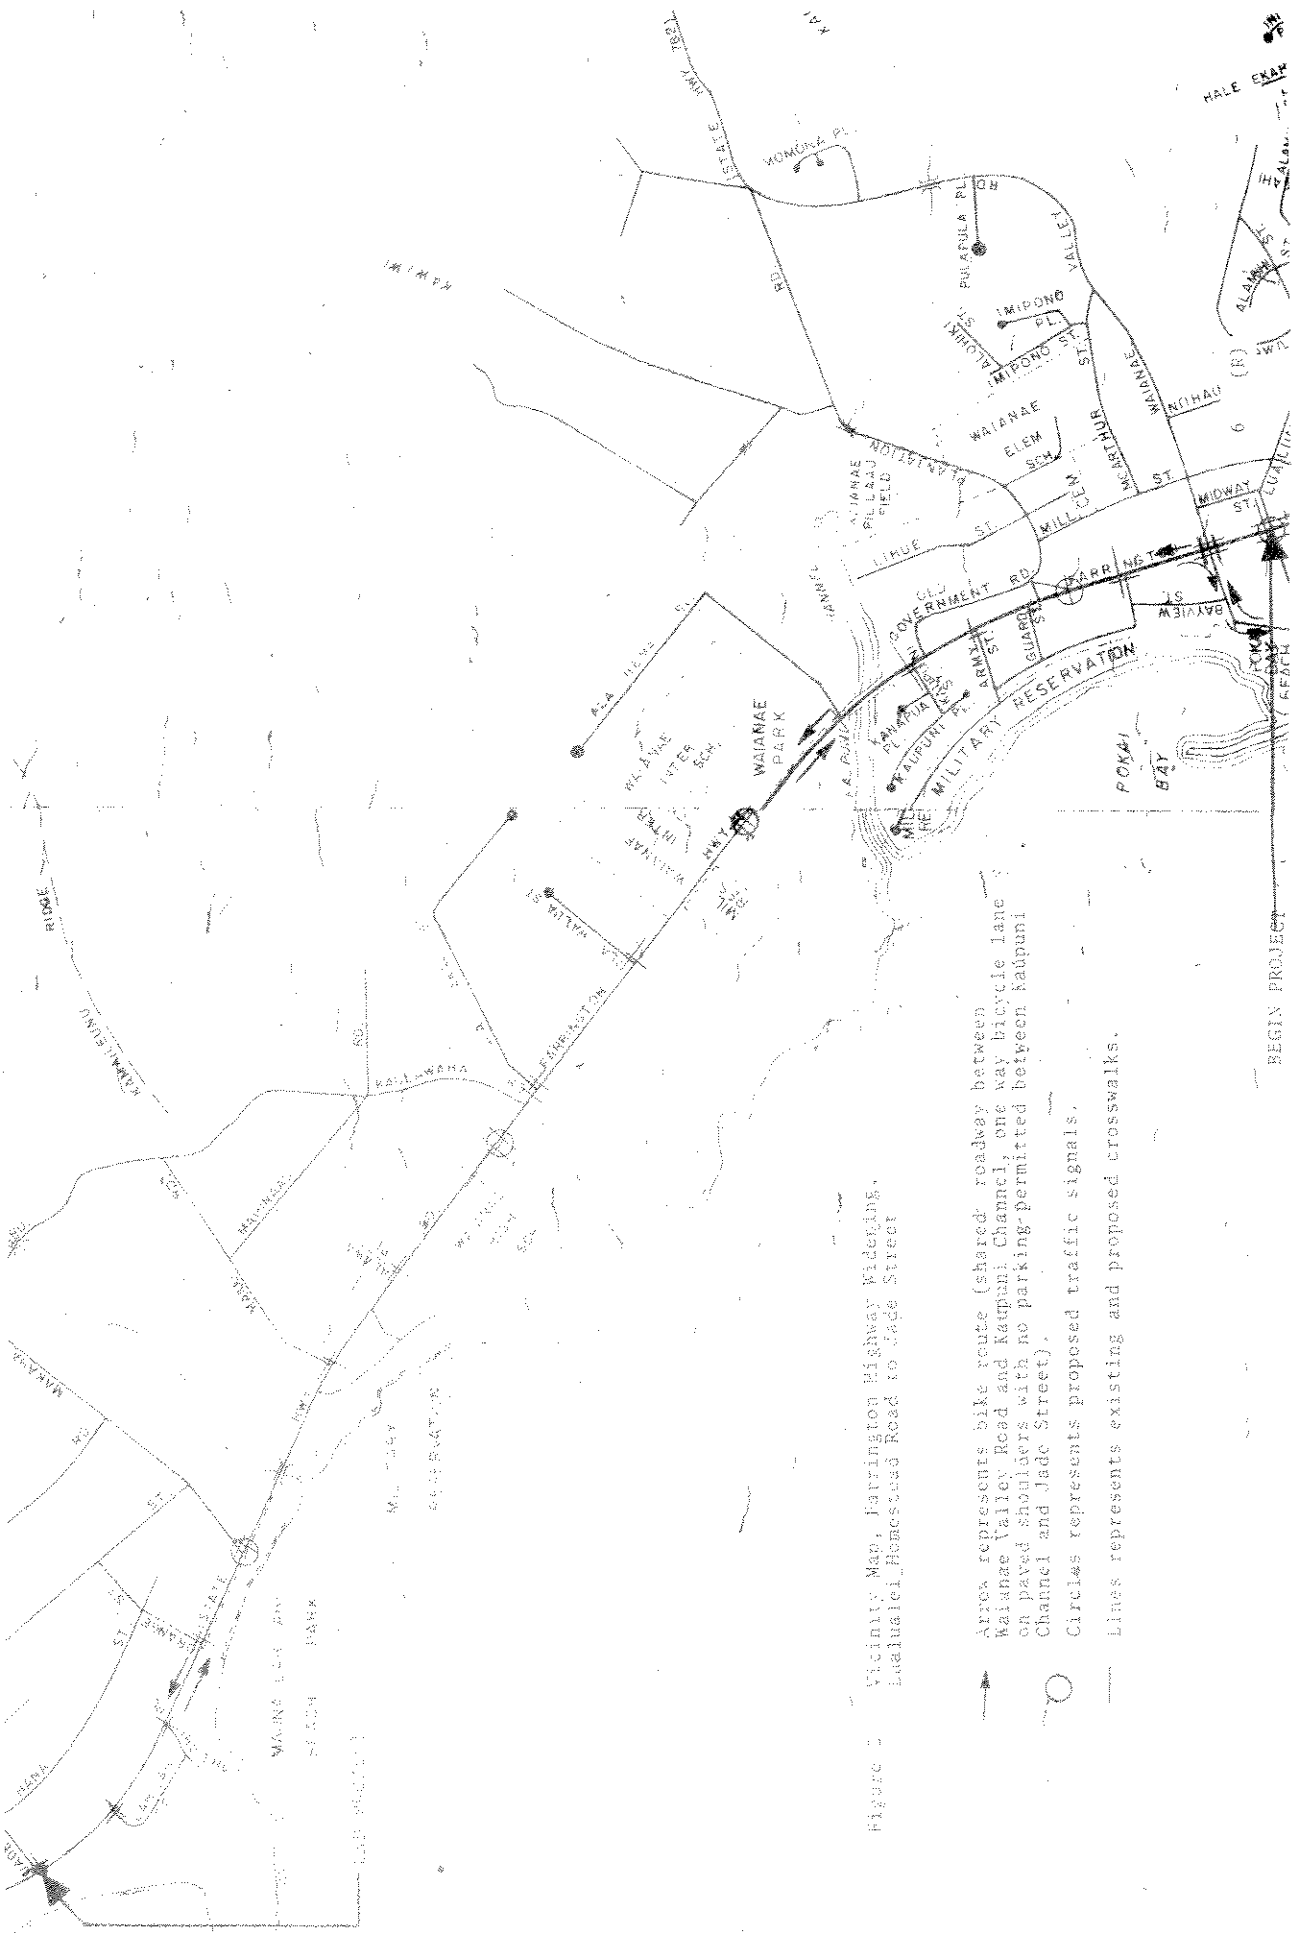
Vicinity Map, Farrington Highway Widening, Luālialel Homestead Road to Jade Street
